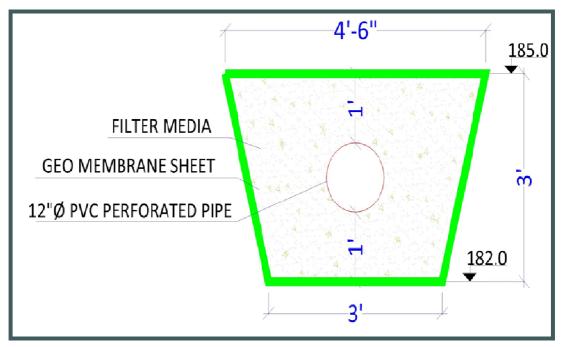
Typical Section of Proposed Infiltration Gallery
